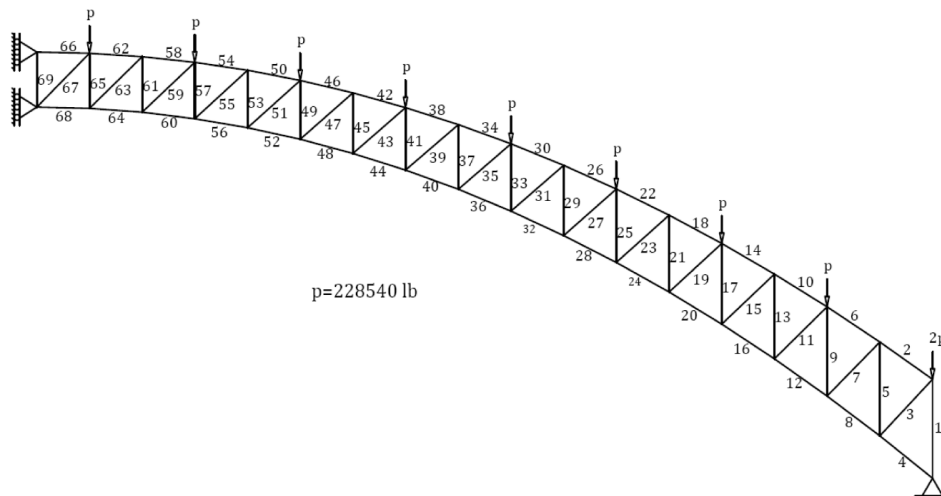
2D finite element model and element numbering of Burro Creek Bridge (for one half of the bridge)
